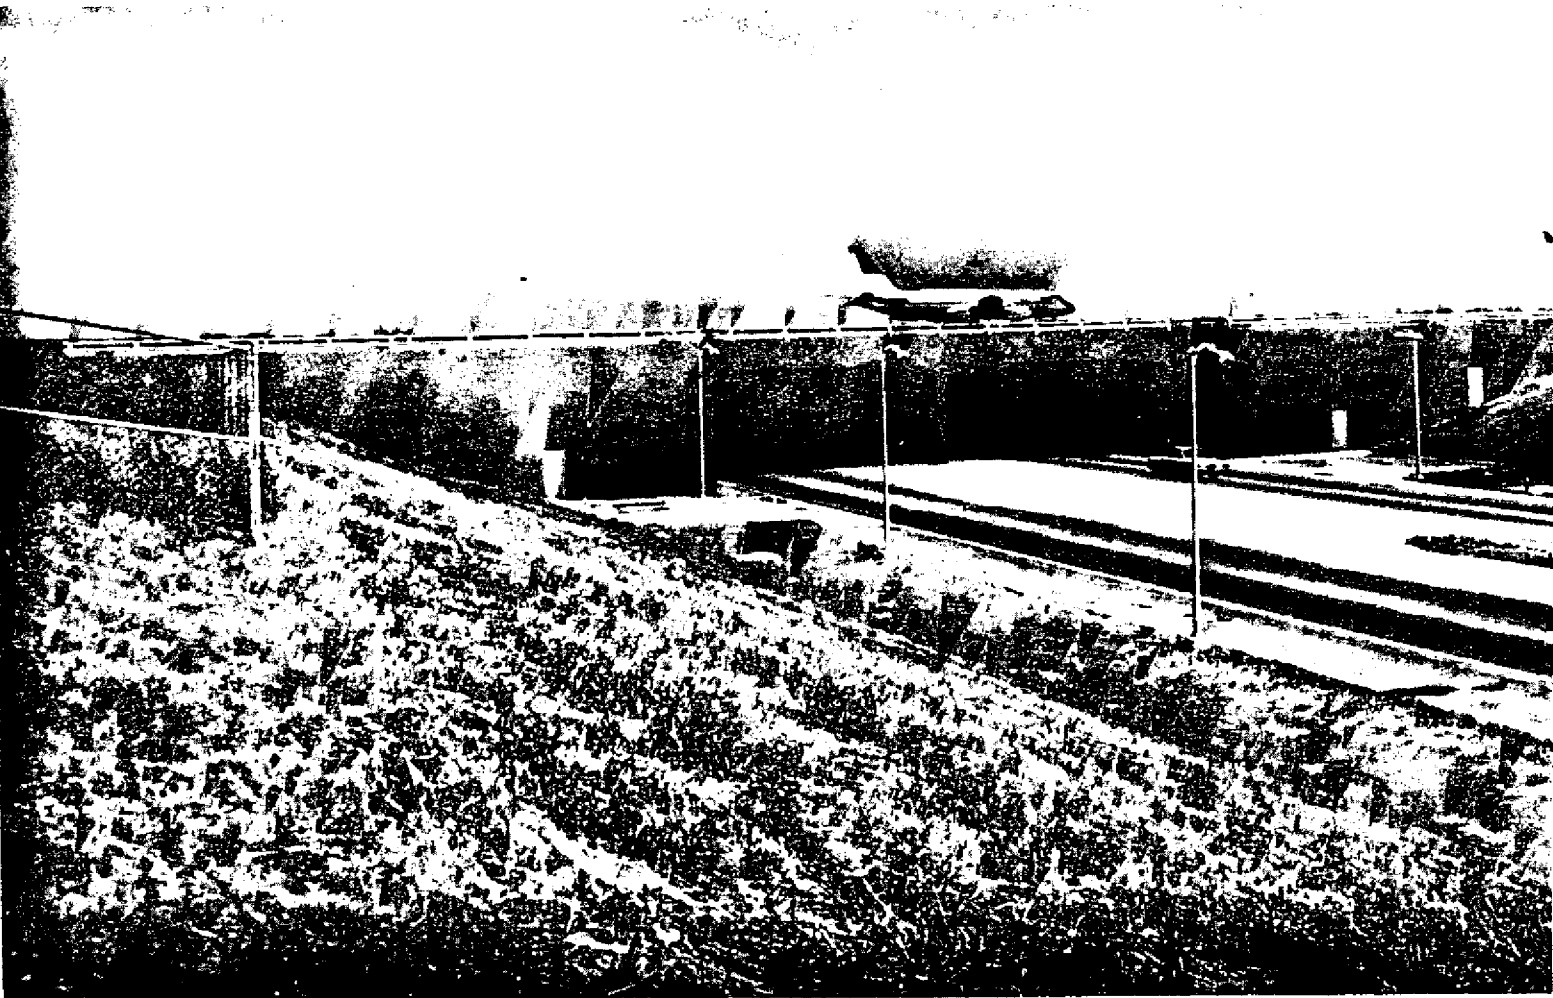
GUARD RAIL, SECURITY FENCING, AND ROADWAY LIGHTING INSTALLATIONS
